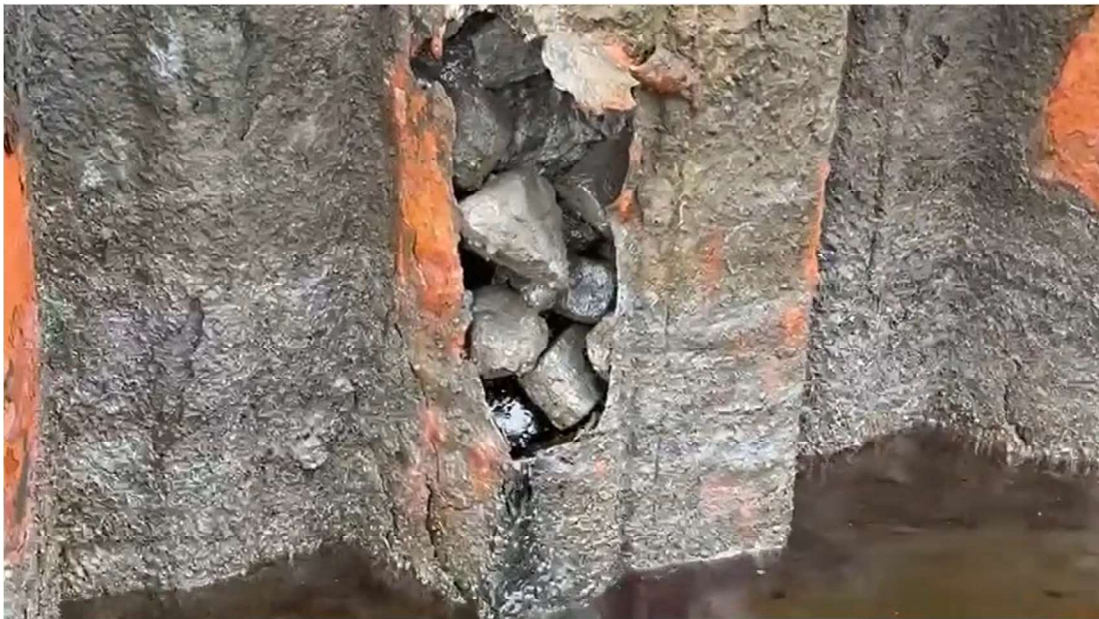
January 1, 2025. General Conditions in Canal south of 3<sup>rd</sup> Street Bridge during in-waterway construction activities.
